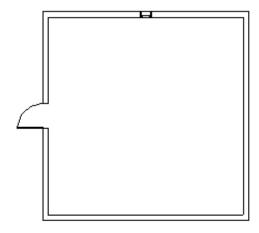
The Use case building: Building "X" (BX). BX is a small building draw into Autodesk Revit Software
